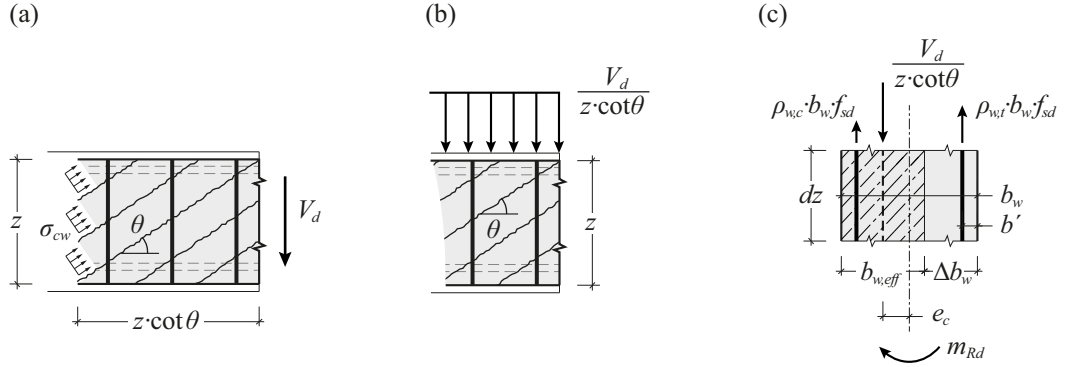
Concept of the web width reduction: (a) web elevation with in-plane shear; (b) web elevation with the vertical component of the shear force per unit length; (c) transverse cross section of the web with equilibrium between the stirrup forces and the compression field.
